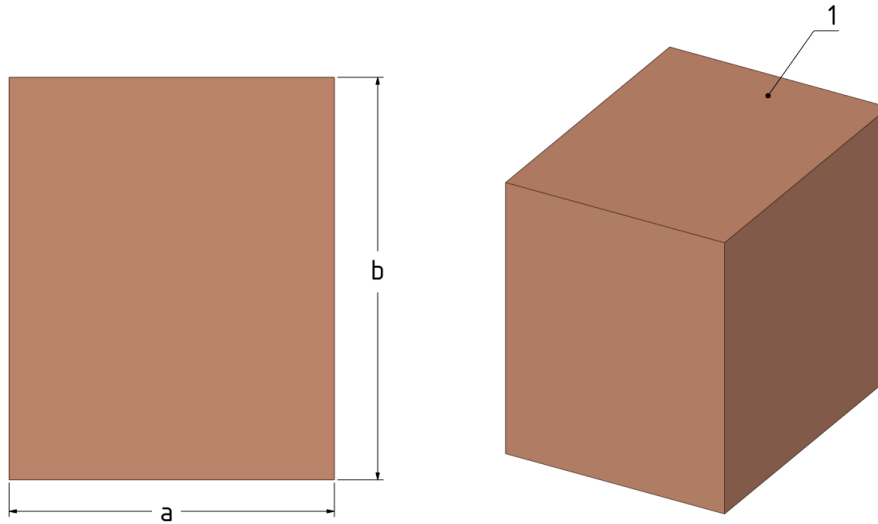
General view of a 3D model of a solid wall (option 1): thickness (a); height (b); solid wall material (1) — masonry, gypsum concrete (type 1, type 2)
